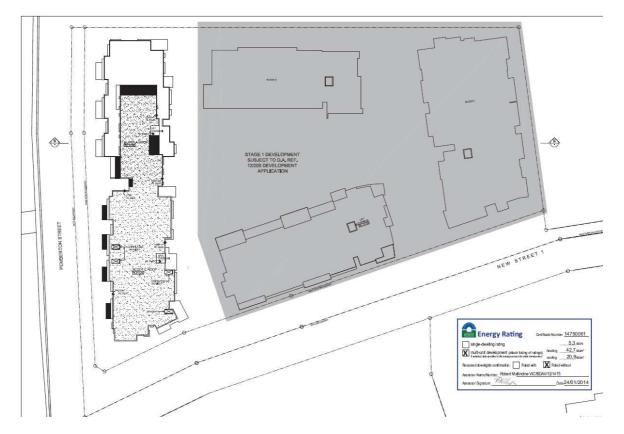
Roof locating Buildings A and C fronting Pemberton Street and Buildings D, E and F behind – source Krikis, Tayler Architects.
